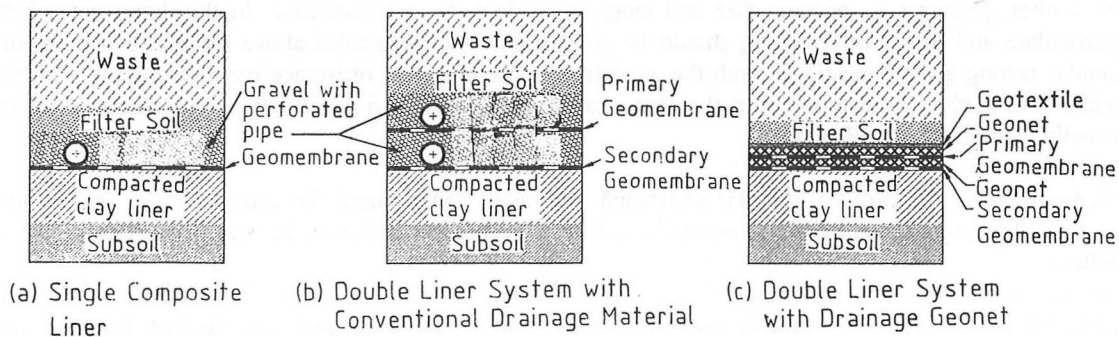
Landfills - Typical Cross Sections at Bottom Level
